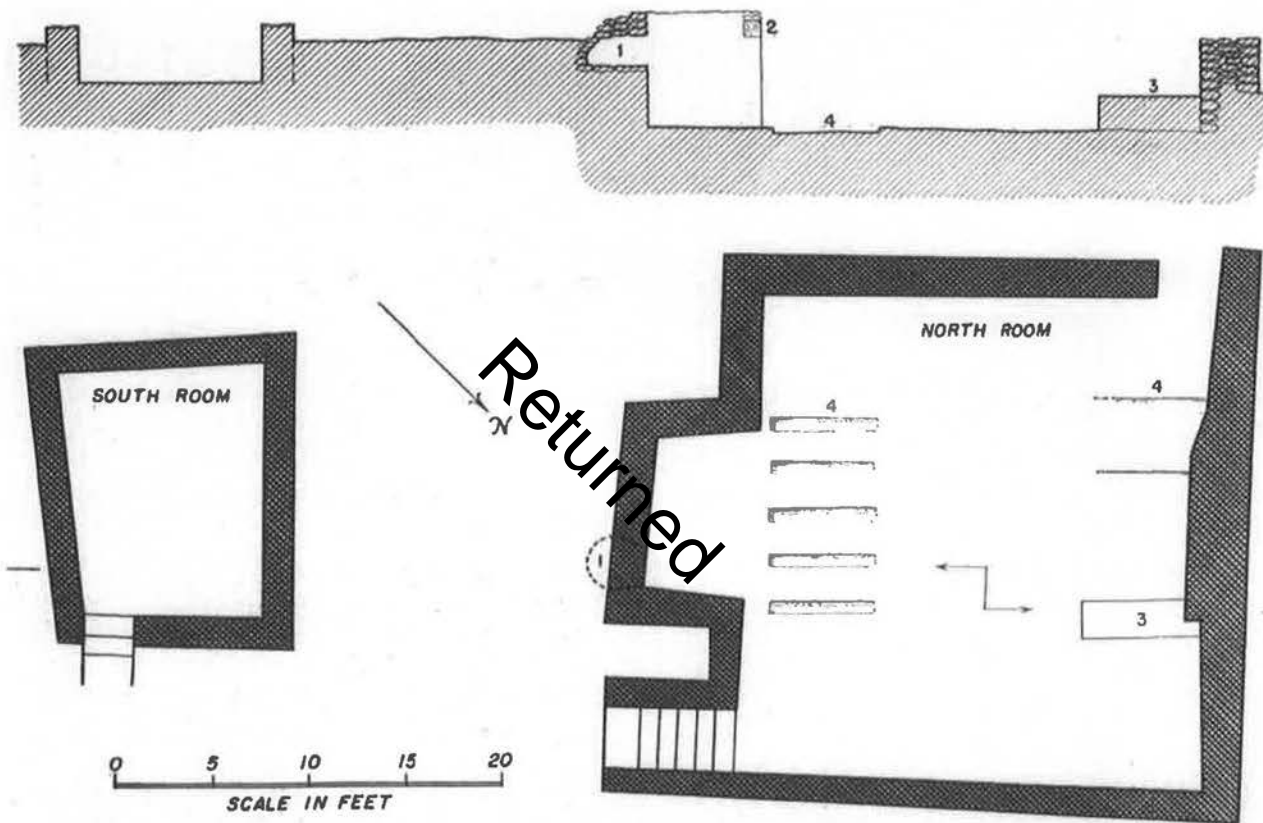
Russell Garrison site plan (source: Ricketson 1964:8-9).
